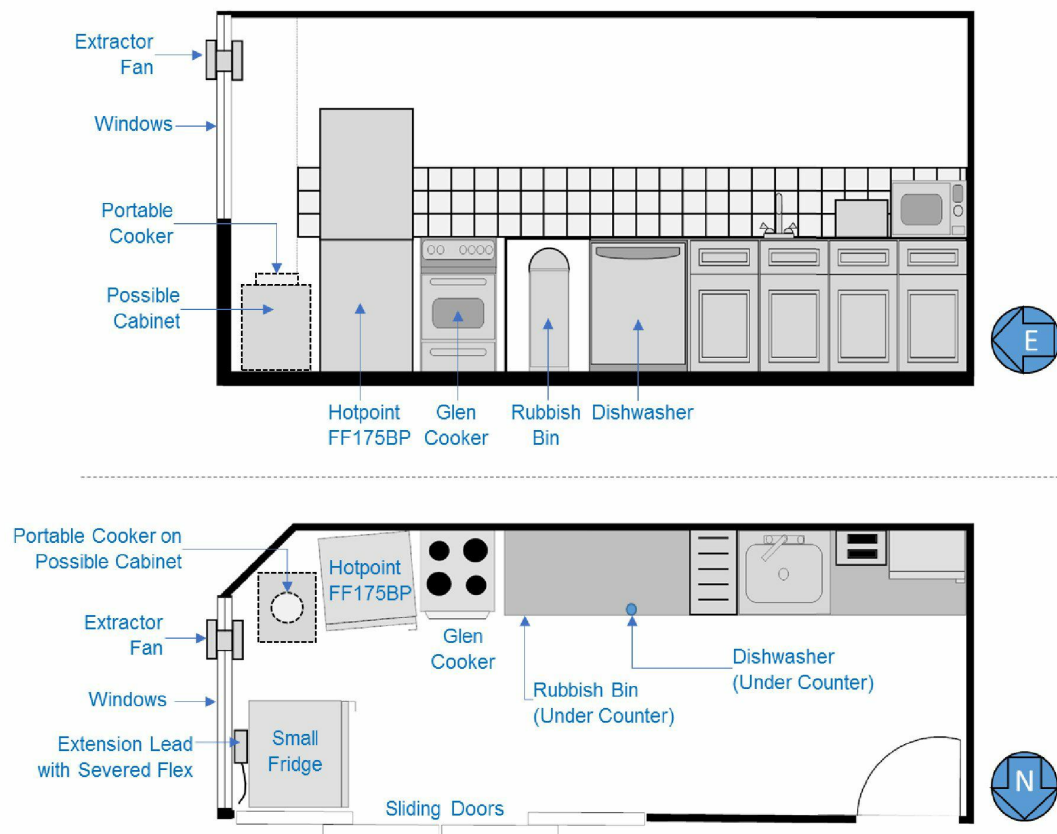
Diagrams showing Exponent's reconstruction of the Flat 16 kitchen: elevation view (top) and plan view (bottom).
